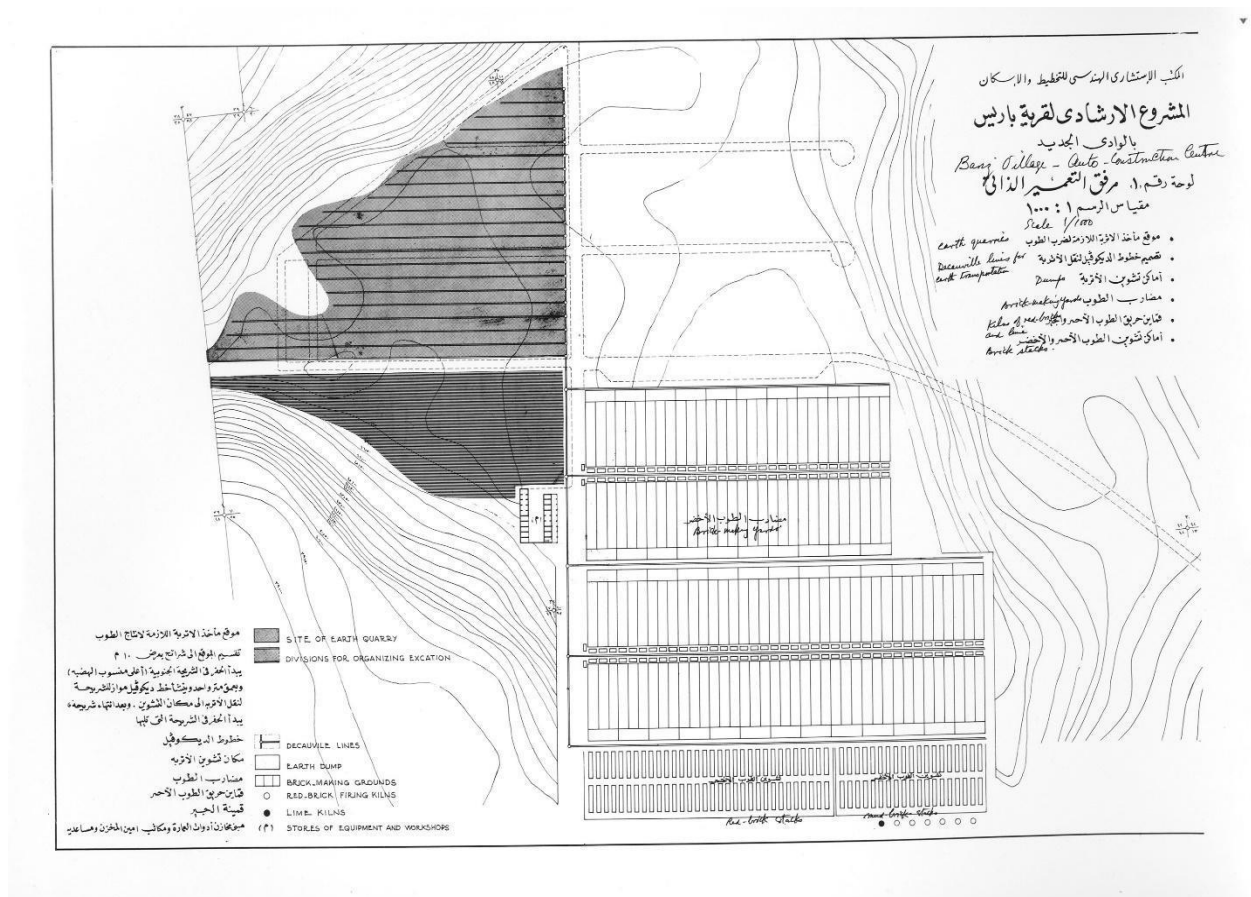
site plan, "Bariz Village - Automated Construction Center"
